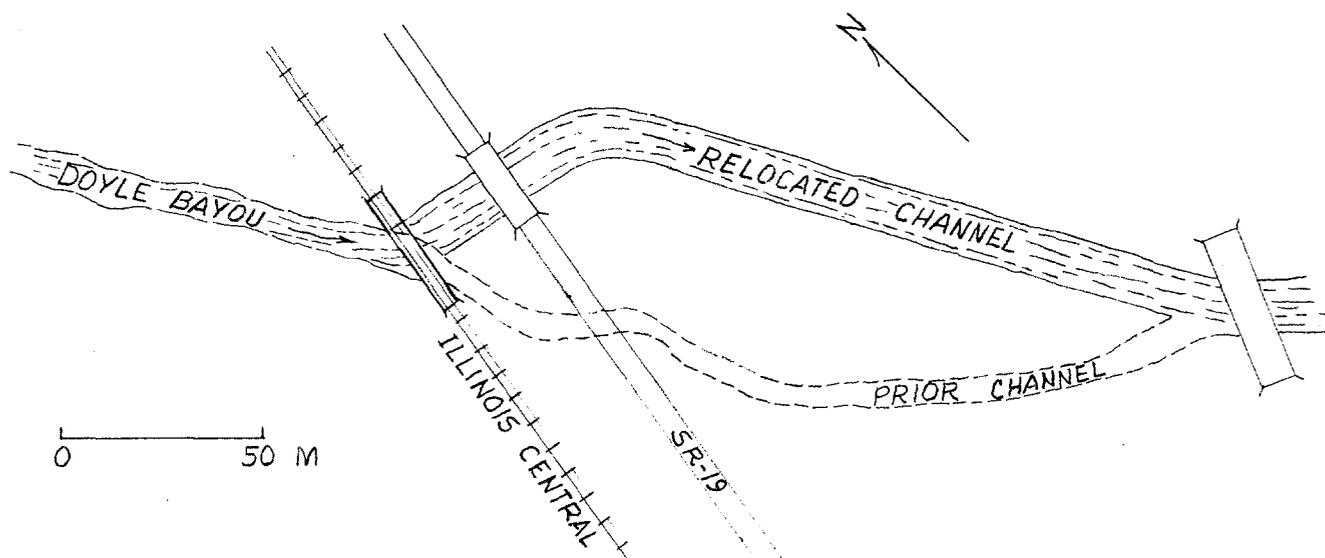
Plan sketch of channel relocation, Doyle Bayou.
